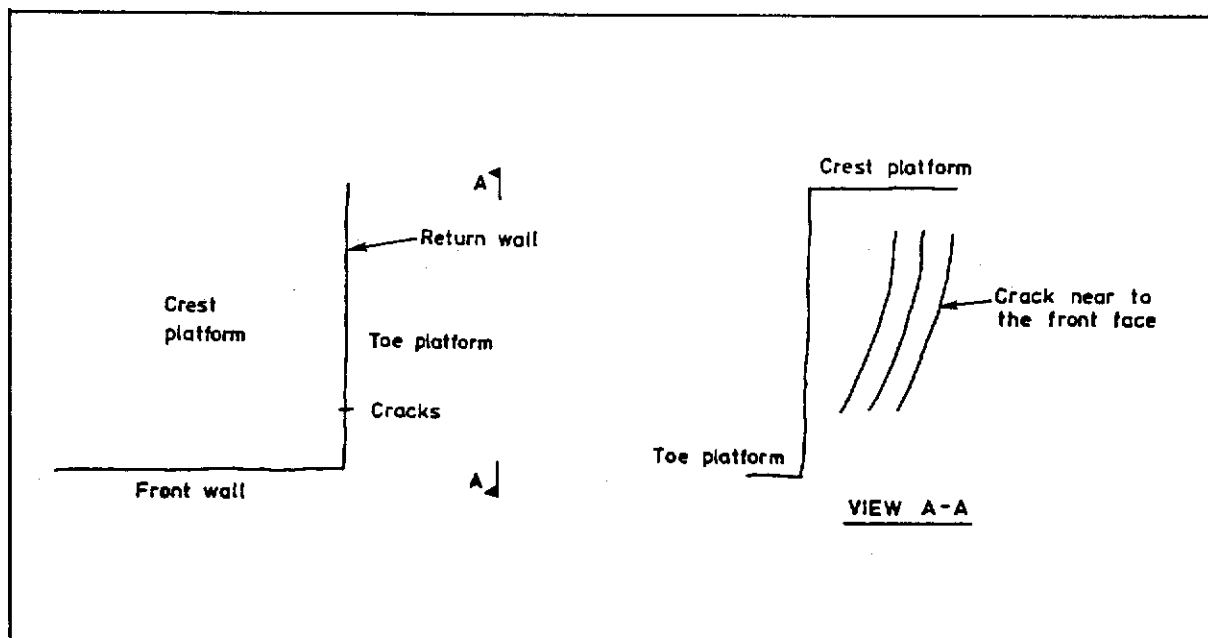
Corner Cracks on Masonry Retaining Walls
